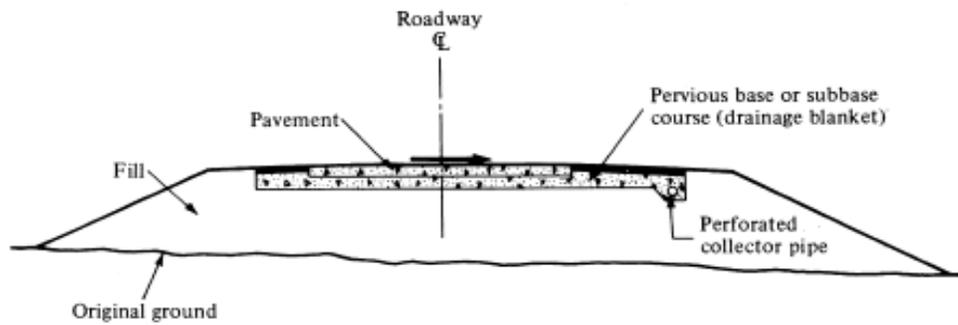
Longitudinal Collector Drain Used to Remove Water Seeping into Pavement Structural Section
